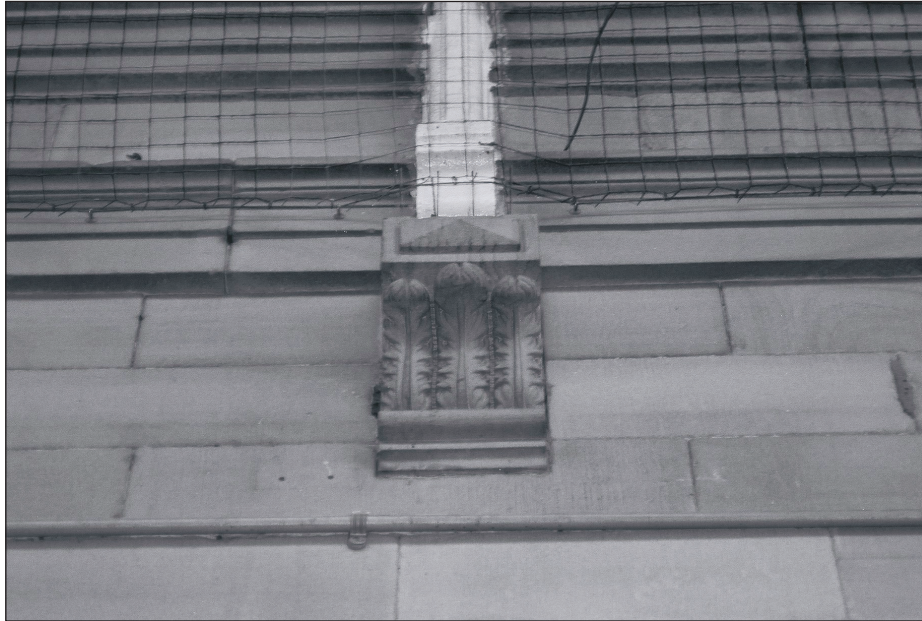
Detail of inserted decorative stone corbel supporting secondary roof structure over platform (film 6.30)
